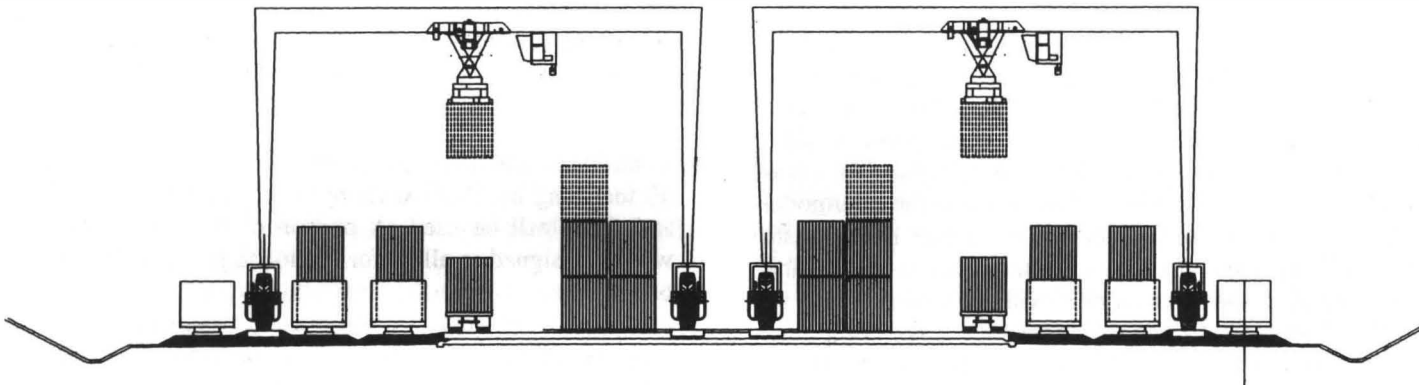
RAILYARD CROSS SECTION (Section A-A from Fig. 3)
